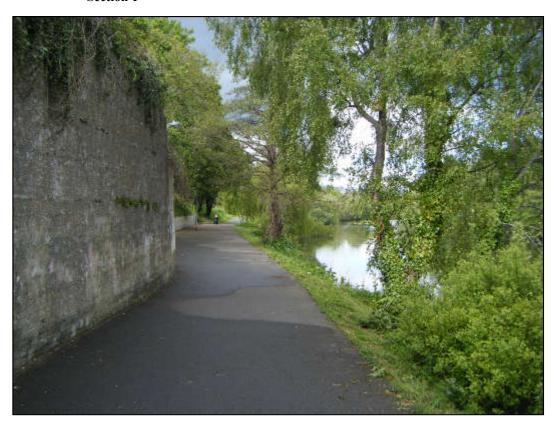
View of the footpath at the west end of Section 1 (note restriction caused by retaining wall)
